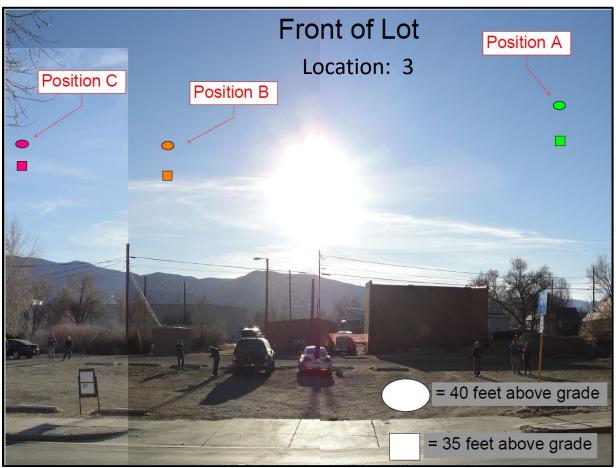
feet and 40 feet at 3 Different Positions on the Site and 4 Different Locations Along on 1st Street.
